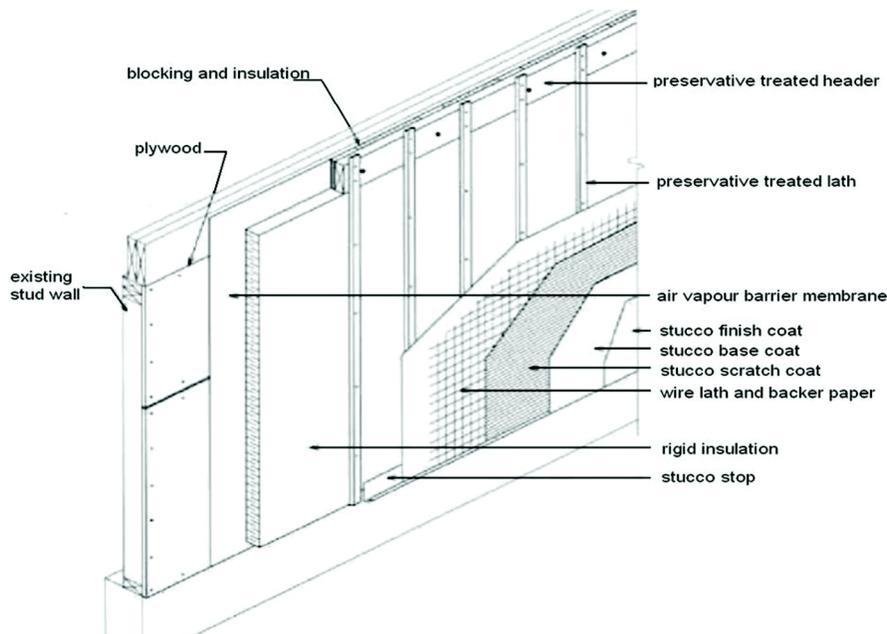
Schematic of wood-framed wall with air vapor barrier membrane, external insulation, and cladding support system.
